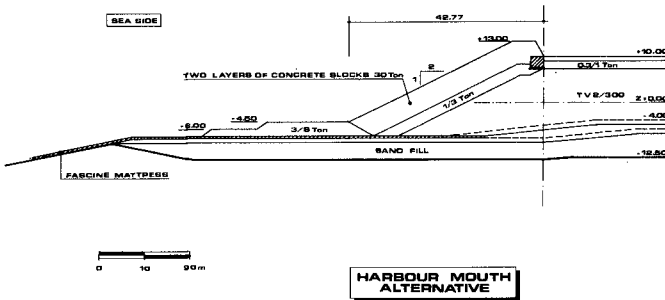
Typical cross-section (axis) - Design alternative harbour mouth (under construction)
